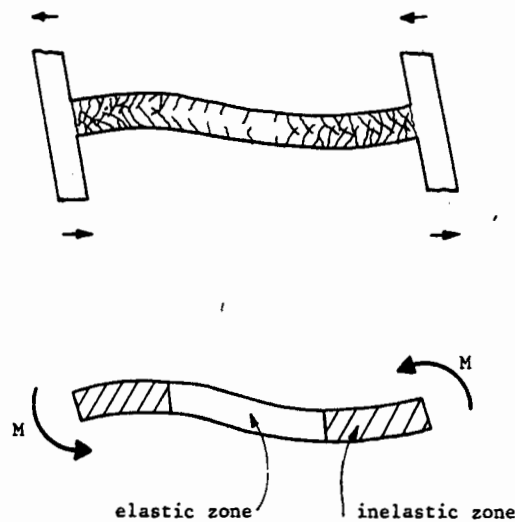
Deformation of girder due to lateral loading of the frame
